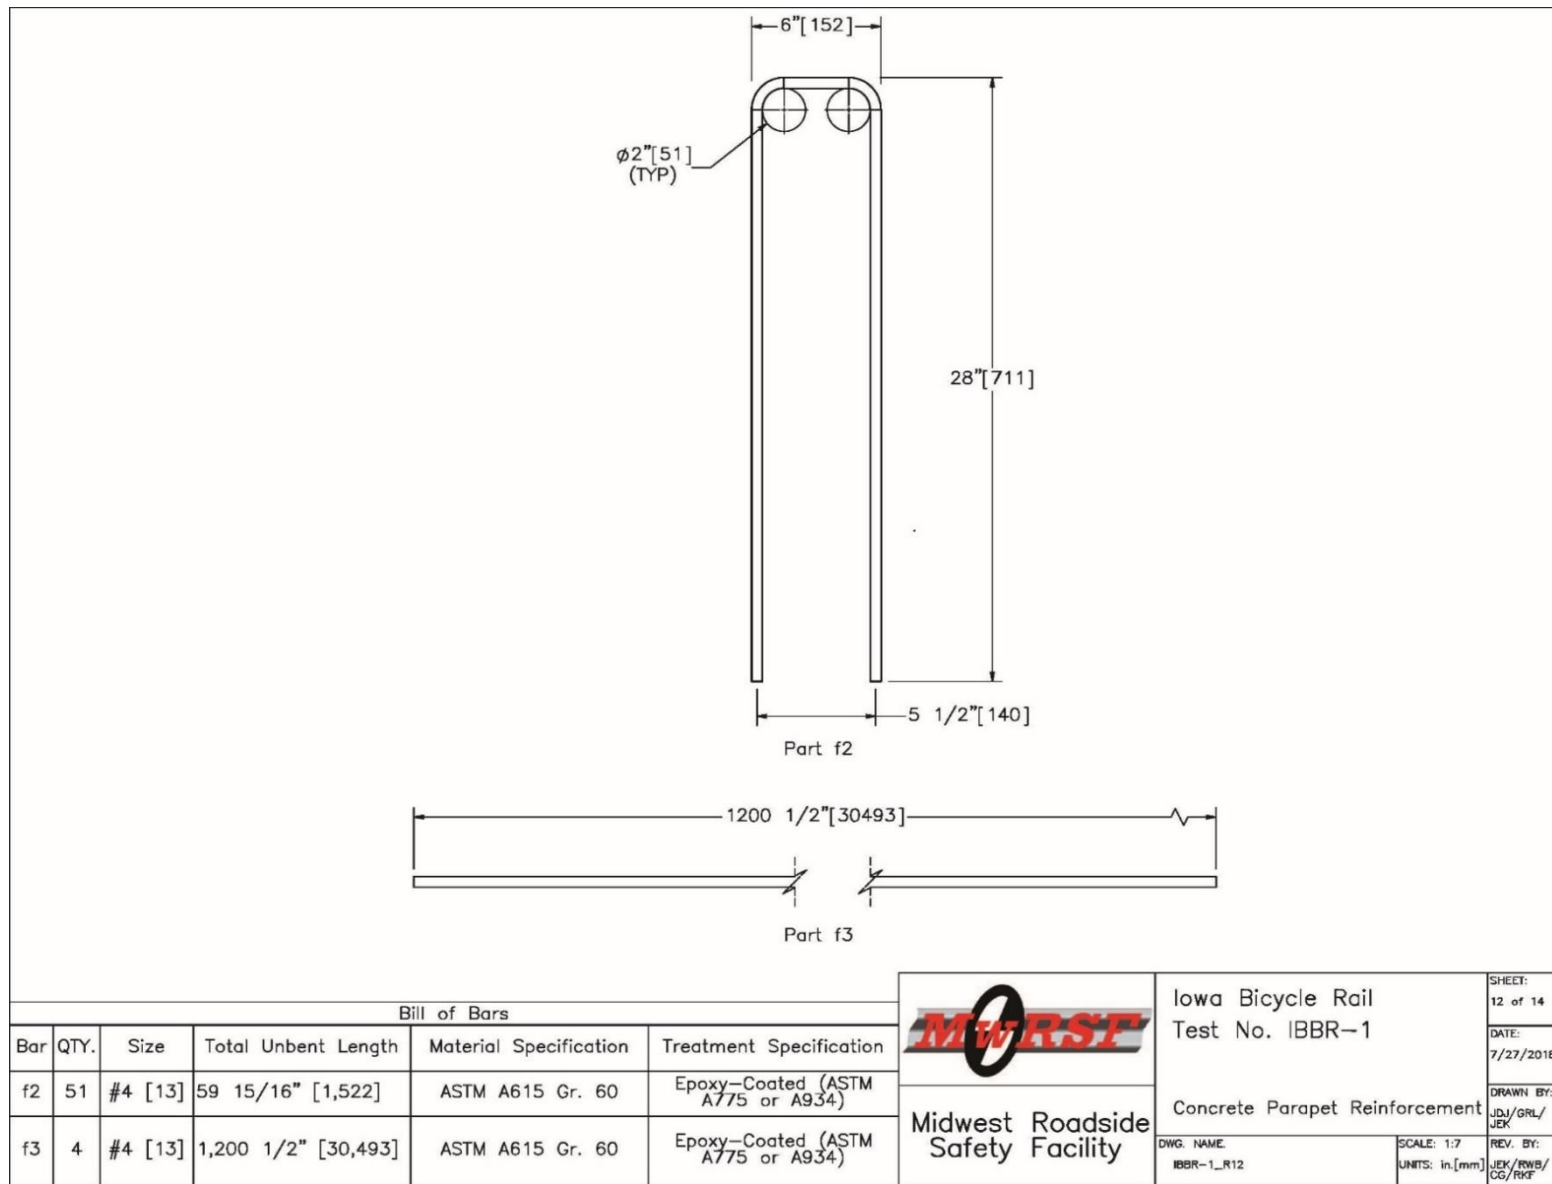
Iowa Bicycle Rail – Concrete Parapet Reinforcement
